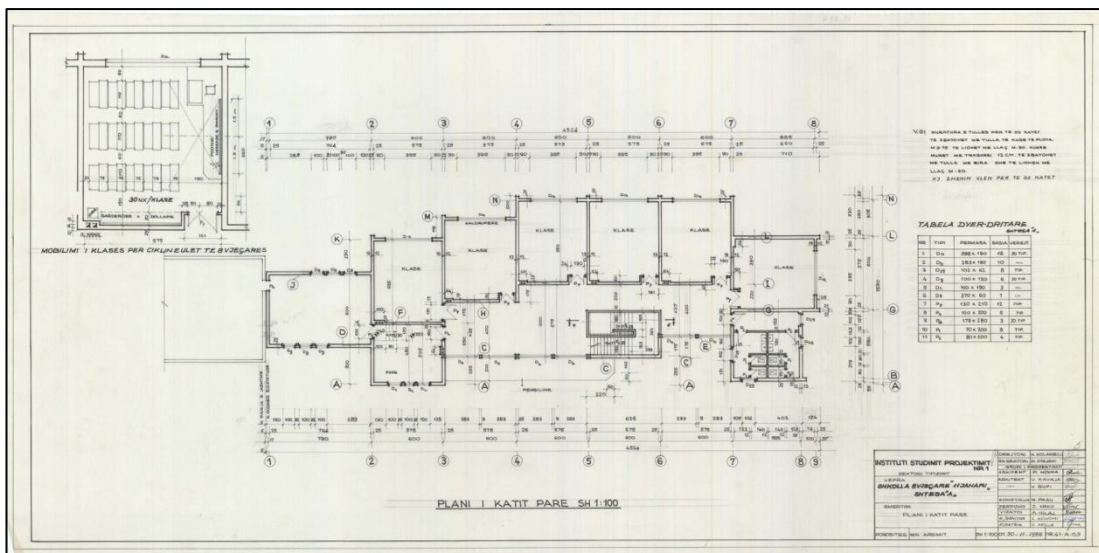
Additional school building and the gym. (State Technical Archive).
